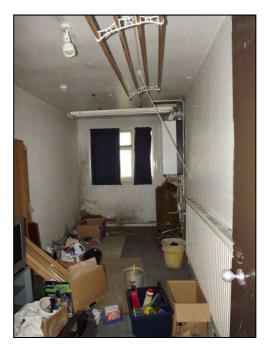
View looking north of Room 5 on Ladies' Walk Level
